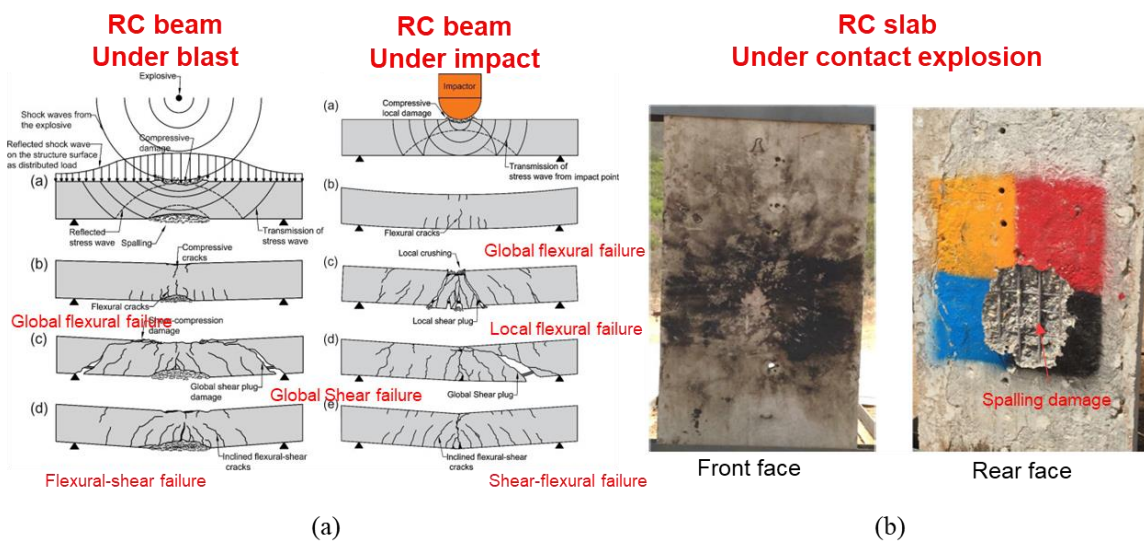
Various damage modes due to stress wave propagation: (a) RC beam under blast and impact loads [35], (b) RC slab under contact explosion [36].
